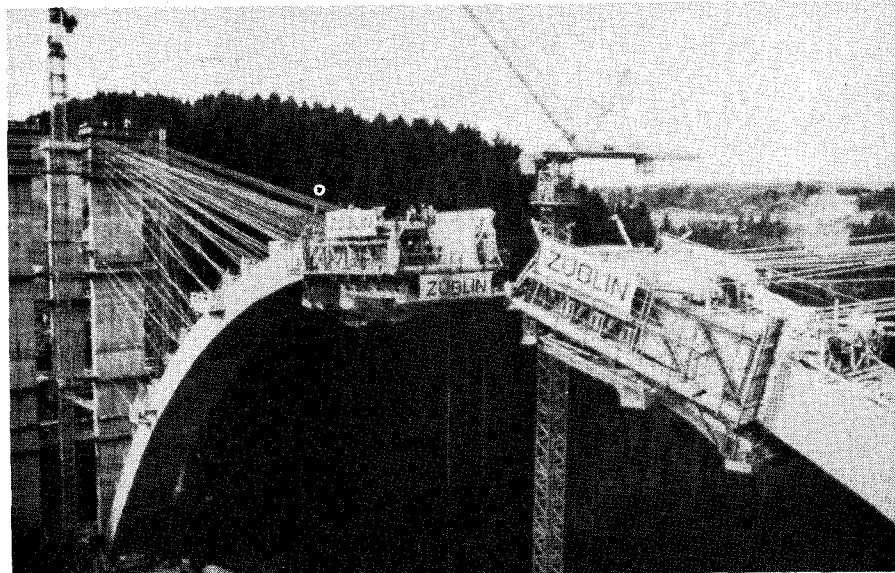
Cantilever construction of Talbrücke Rottweill-Neckarburg Bridge, southwest of Stuttgart, West Germany. (Courtesy: W. Zellner.)
